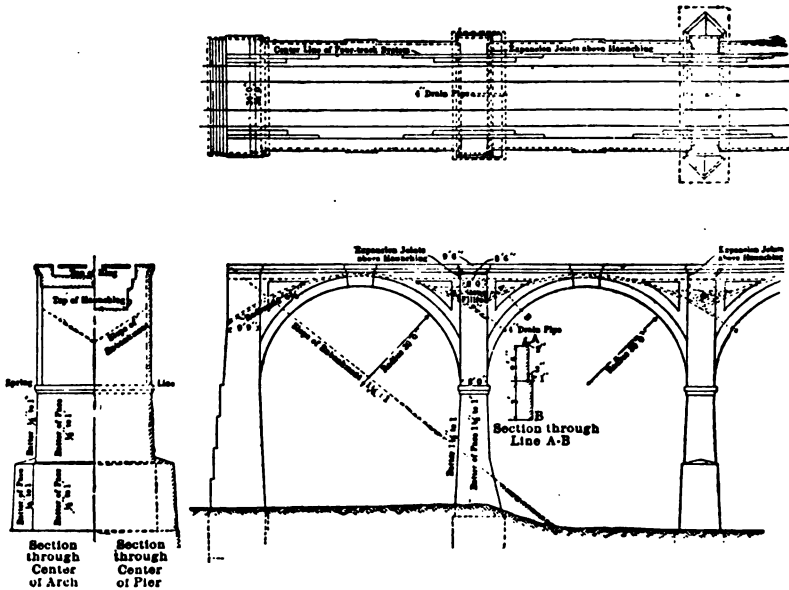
Pennypack Creek Bridge, New York Short Line Railway.
